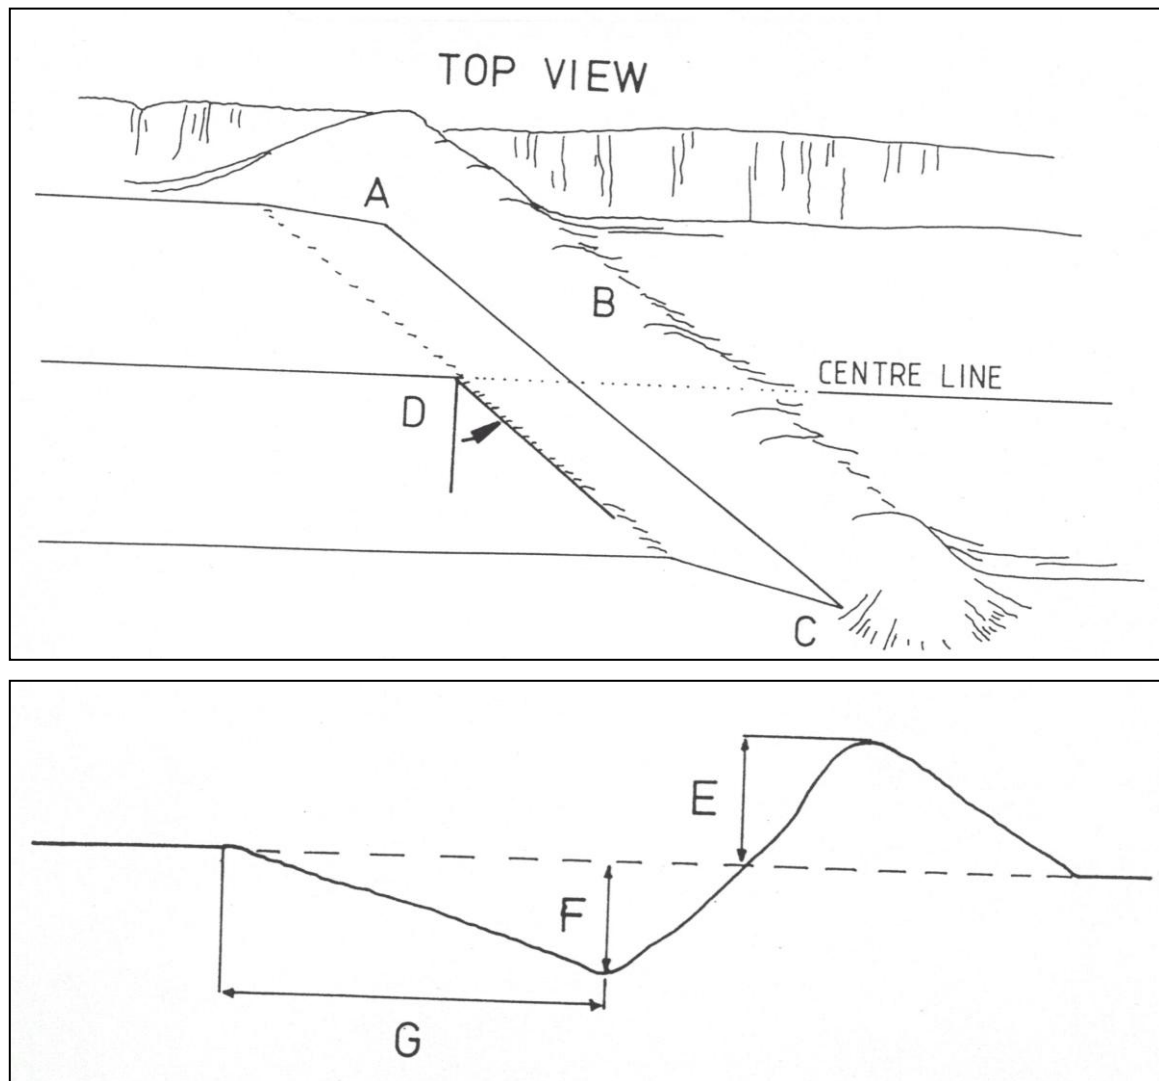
Layout and dimensions of crossbanks/mitre drain. Average specifications given, adjust for situation as required. A=at tie in point with road verge cut 15-30cm into the road bed; B=crossbank height should be 30-60cm above the road bed; C=mitre drain outlet should be cut 20-40cm into the road verge; D=angle mitre drain  $30^{\circ}$  to  $40^{\circ}$  downslope of the road centre line; E=crossbank height can be up to 60cm; F=mitre drain depth can be up to 45cm; and G=length of G can be 90-120cm.
